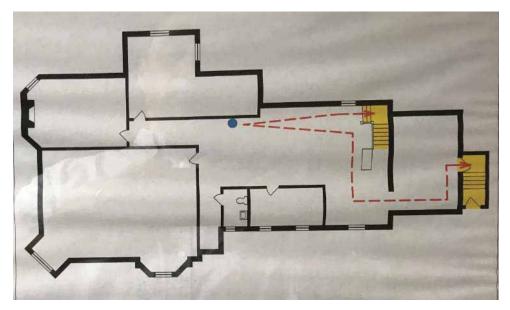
Building mounted egress basement floor plan diagram (N.T.S.)
